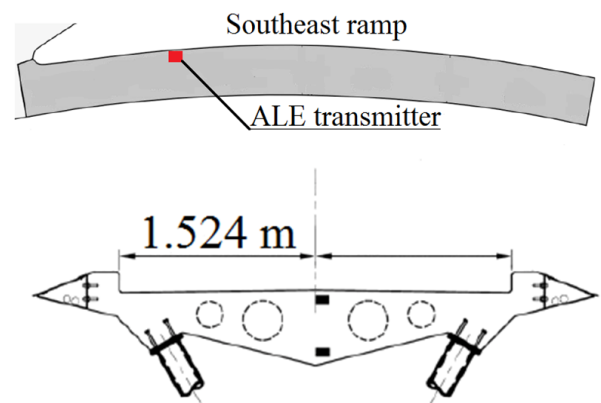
Southeast approach ramp plan view (up) and cross-section (down) (Source: [21])
